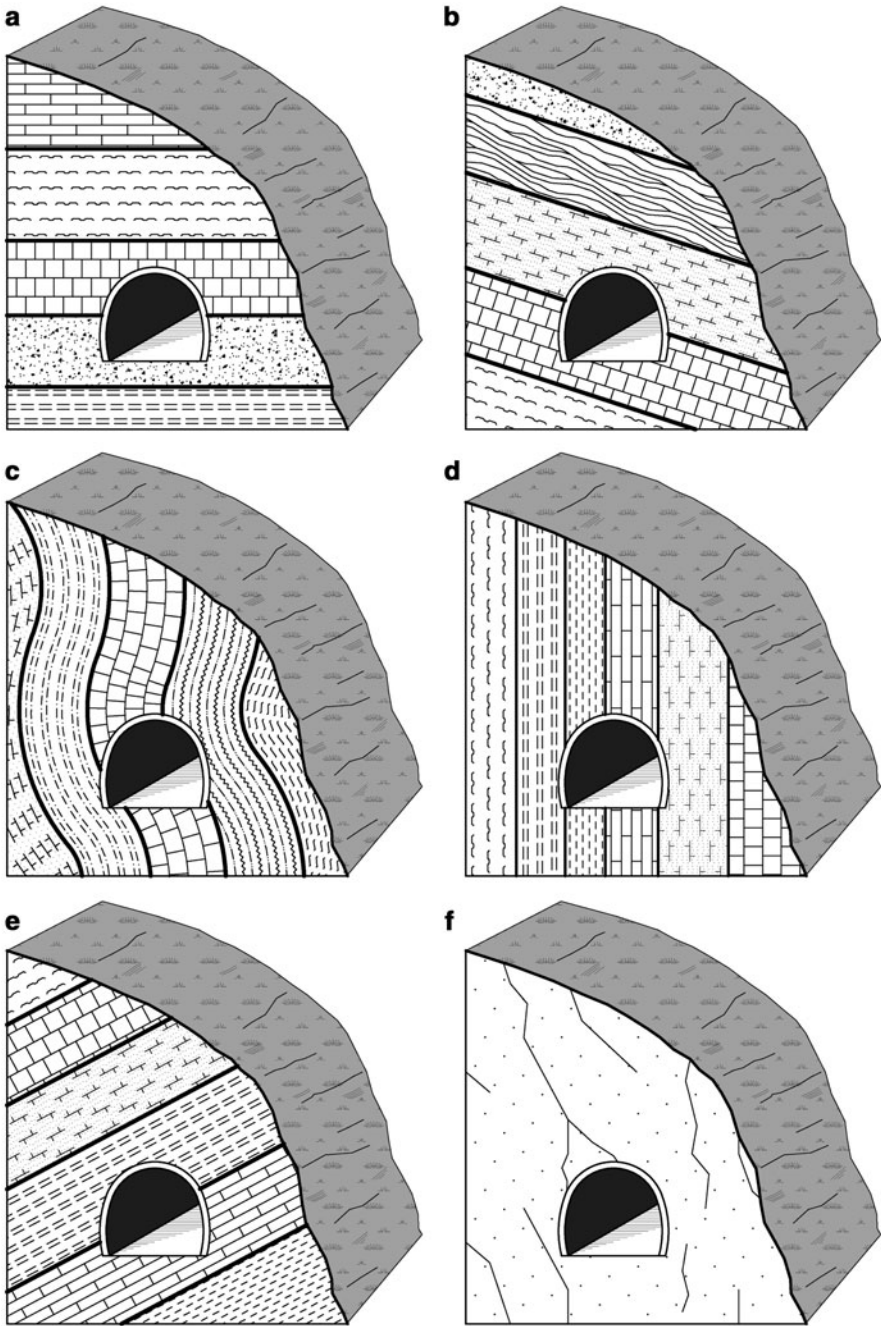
Dissymmetric stresses affecting a shallow tunnel along slope
